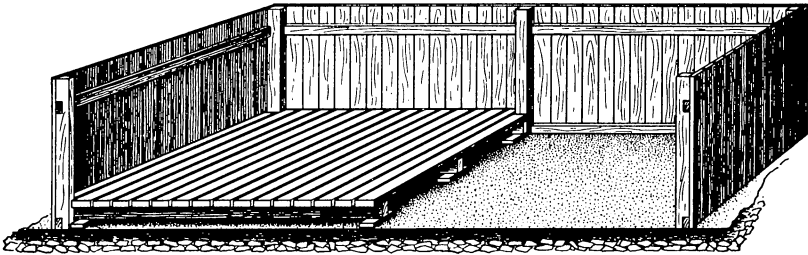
Pen, showing concrete floor with removable wood overlay.
